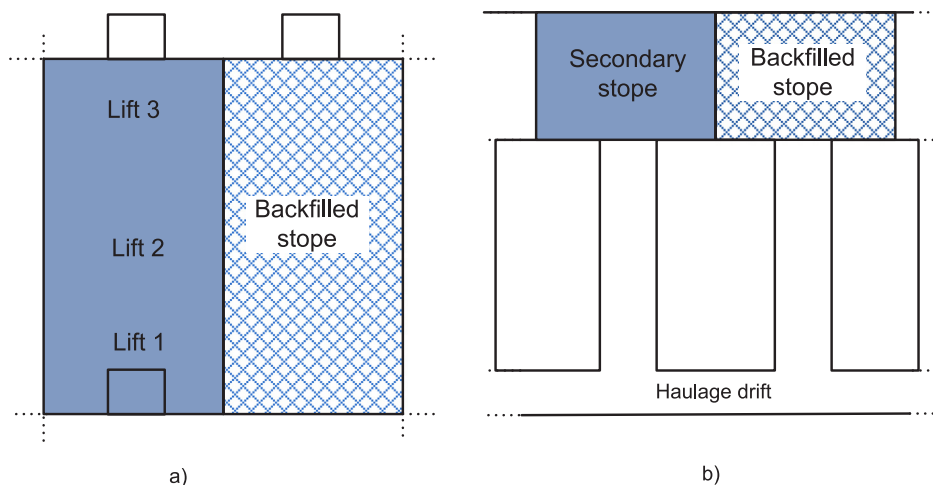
Stope extraction sequence in vertical block mining system: a) longitudinal section; b) plan view.
